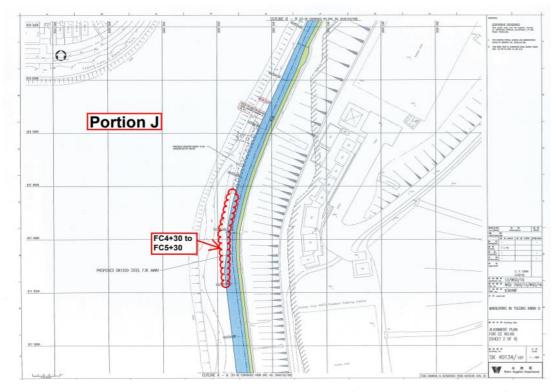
Location Plan – Landfill Stage 1 (Area FC4+30 -FC5+30)
